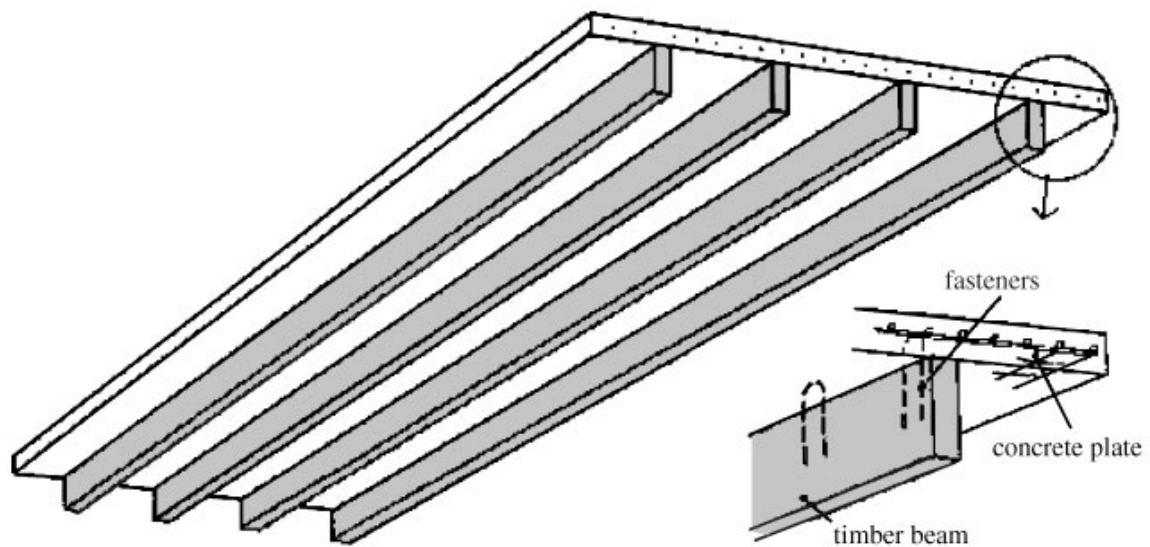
Schematic of a typical timber-concrete composite floor system (Ceccotti, 2002)
